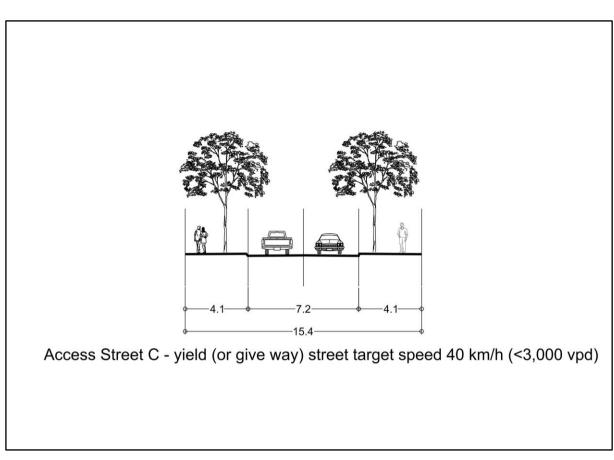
Access Street C (Liveable Neighbourhoods) – Typical Cross-Section
